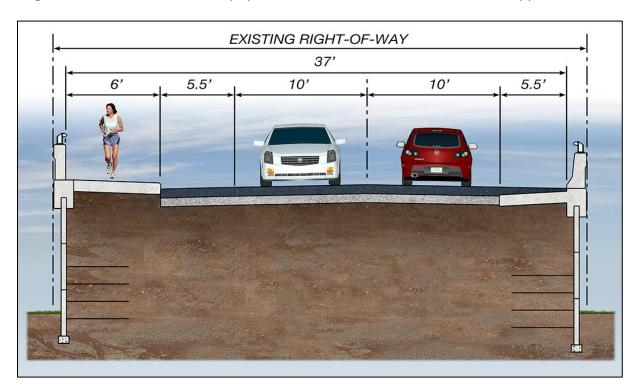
Proposed Roadway Section West of Proposed Fixed Bridge
